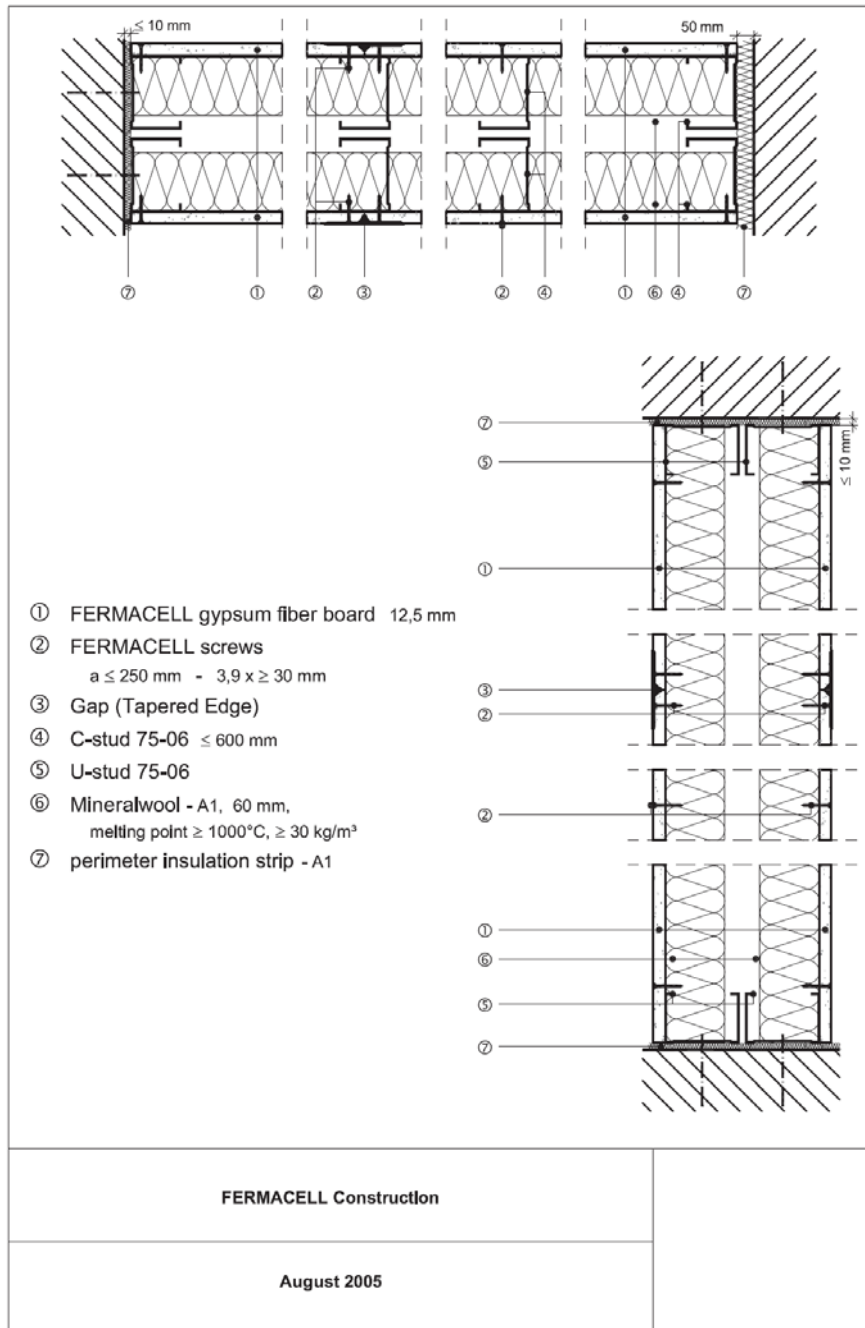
Cross-section overview of the 1S24 wall construction with 2 layers of mineral wool.
